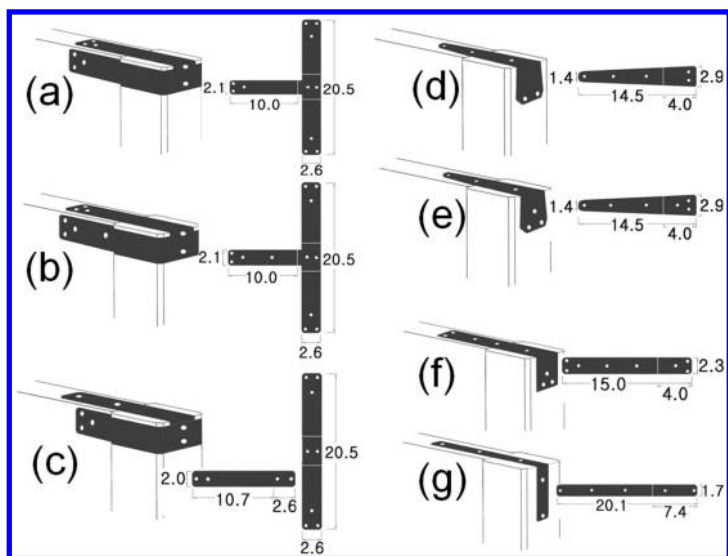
Shapes and dimensions of the metal plate connectors. The dimension of the numbers is centimeter.
